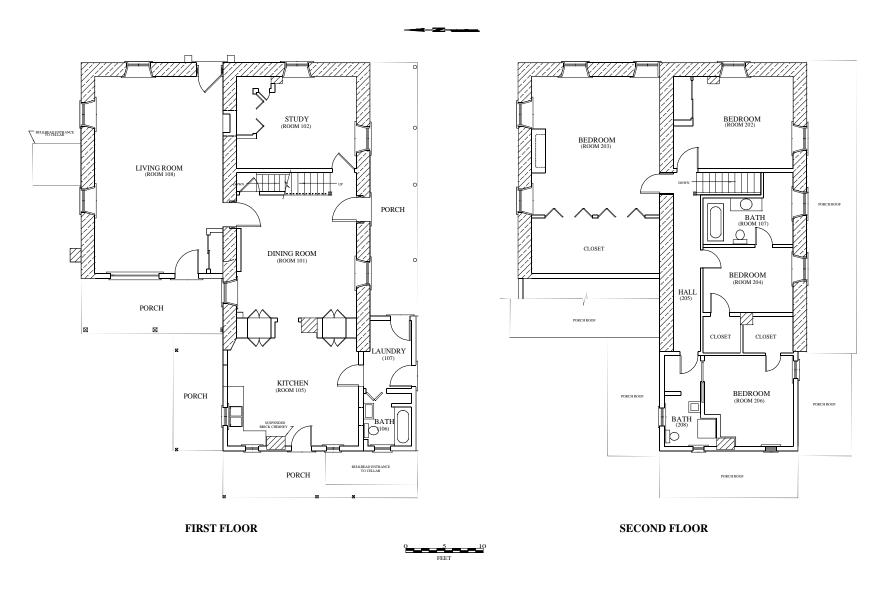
First and second floor plans of the Howarth House, showing existing conditions (2001).
